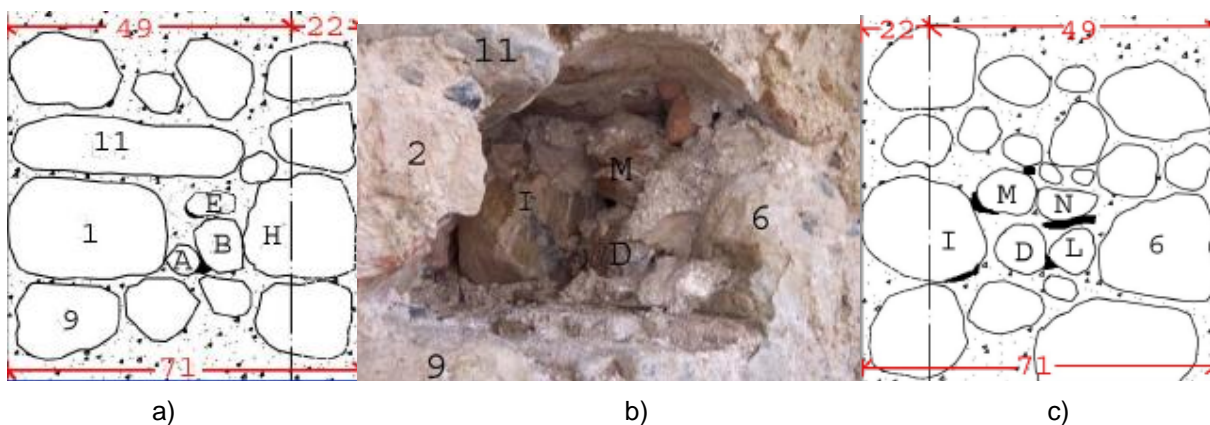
Drawing of wall section: a) left face of section, b) photo of the excavation, c) right face of the section. (Binda, 2009)
